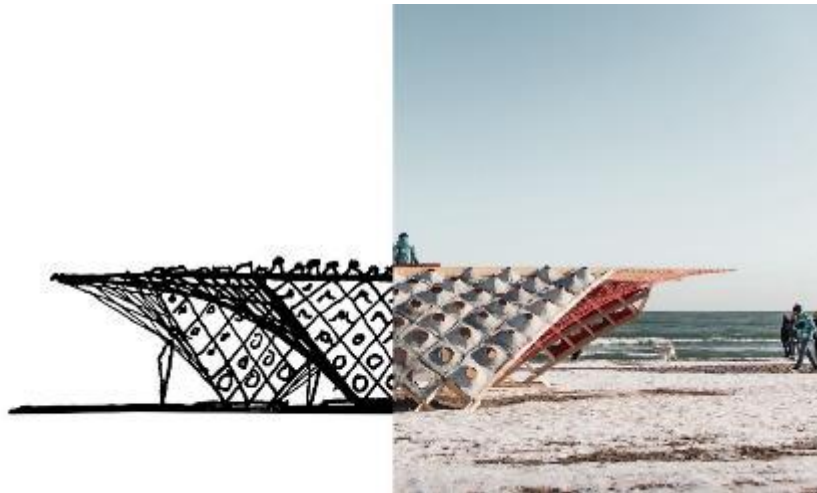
A sketch showing the development of the project from initial sketch to built pavilion
